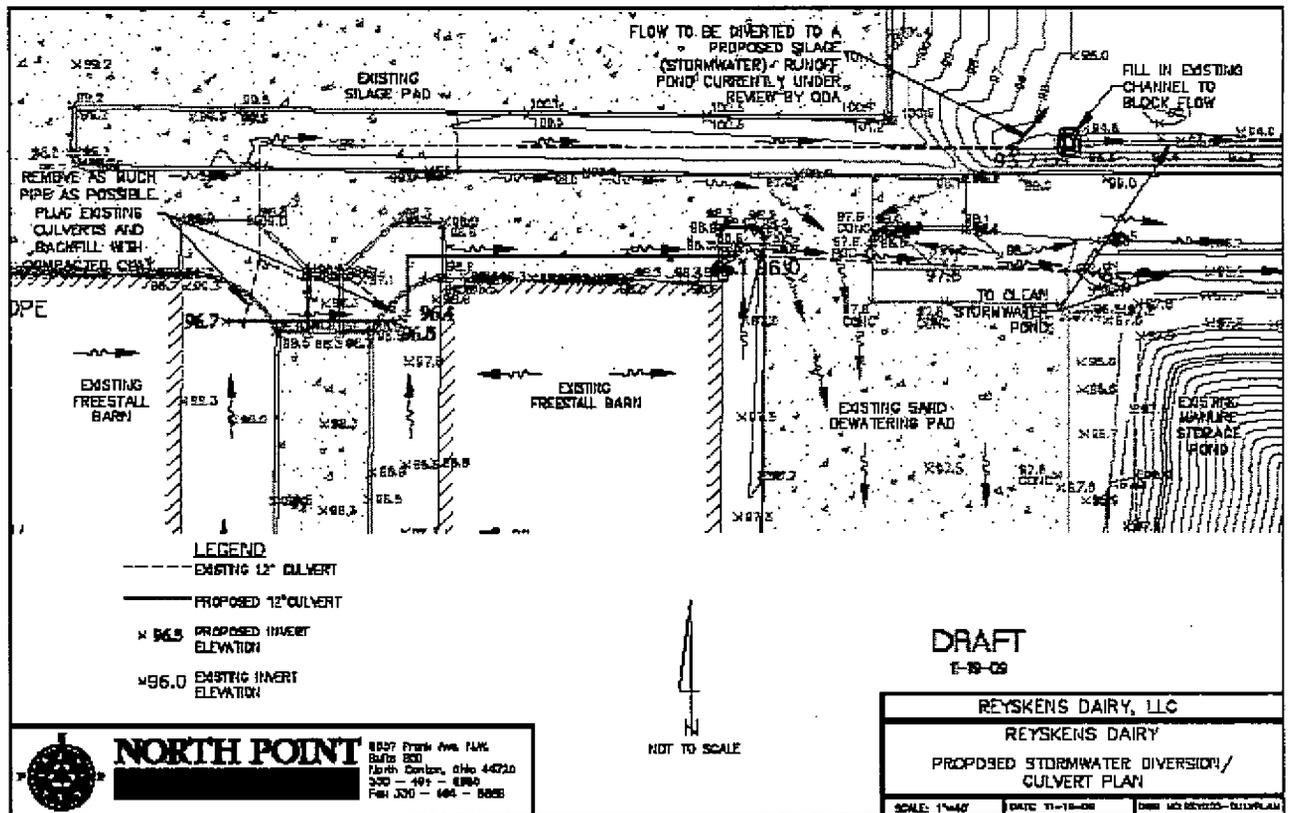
Draft proposed stormwater diversion/ culvert plan for Reyskens Dairy
